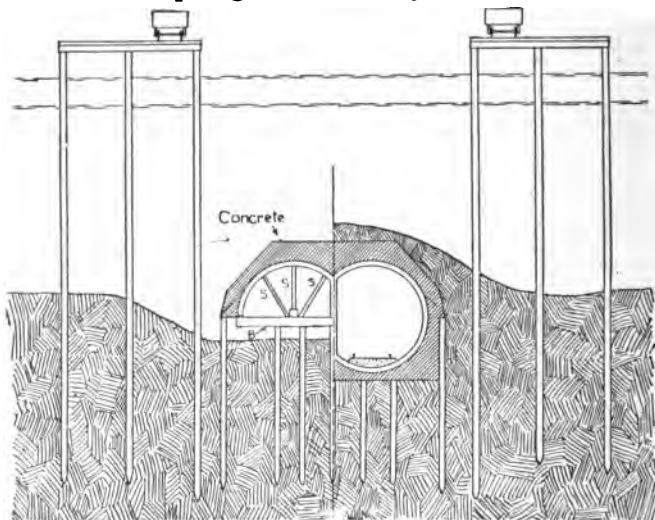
Second method used for the Harlem River Tunnel. The top half of the tunnel was lowered on to sheet piling, to form a water-tight chamber, in which the lower half was built.
